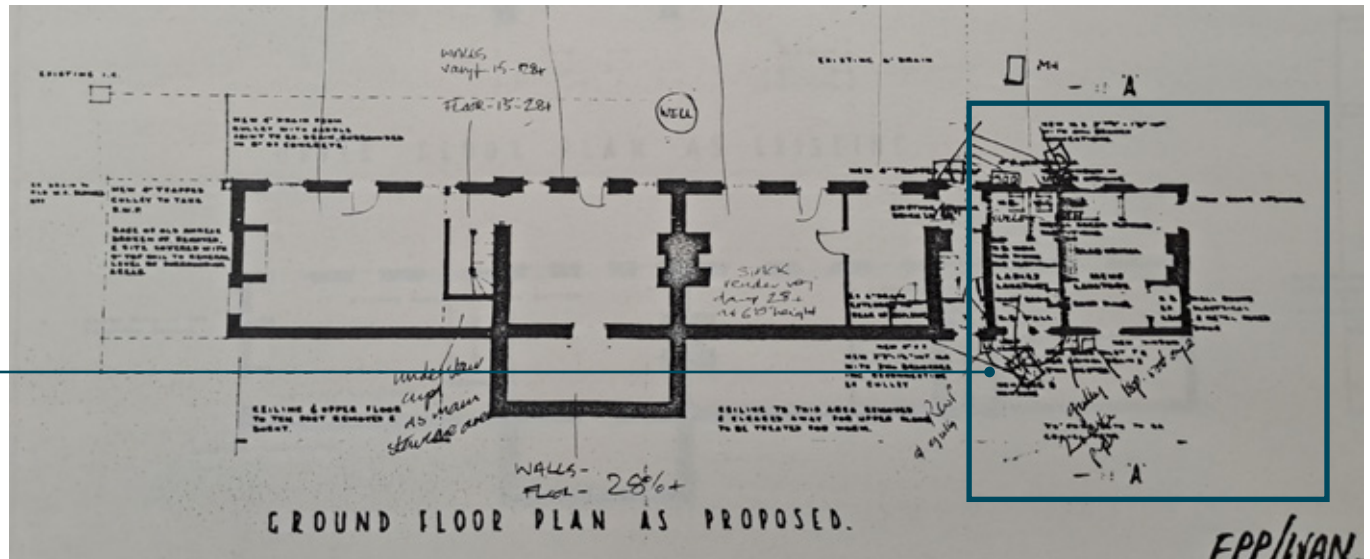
Ground floor plans from 1957 as proposed, indicating the design of new public toilets in the south wing of The Temple. City of London Corporation, HB/TEM/10
